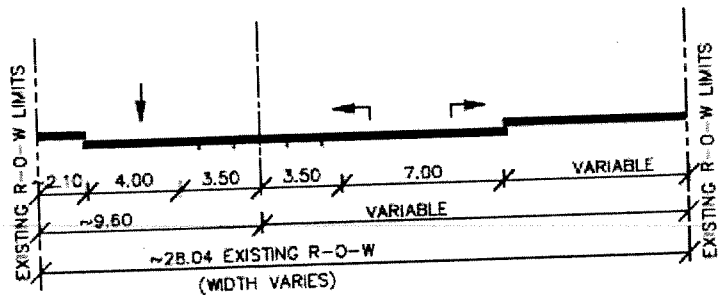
Cross-section taken immediately to the south of the Adelaide / Richmond St ramps.
